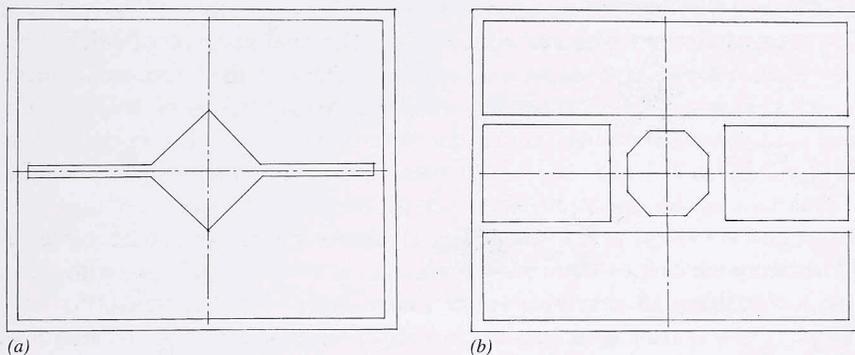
Four-unit blocks, Balta: (a) Foundation A; (b) Foundation B.
